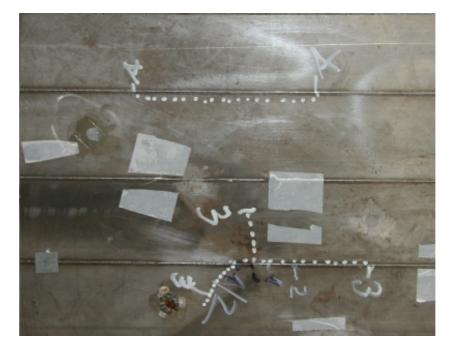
specimen A: fatigue crack propagation paths.
